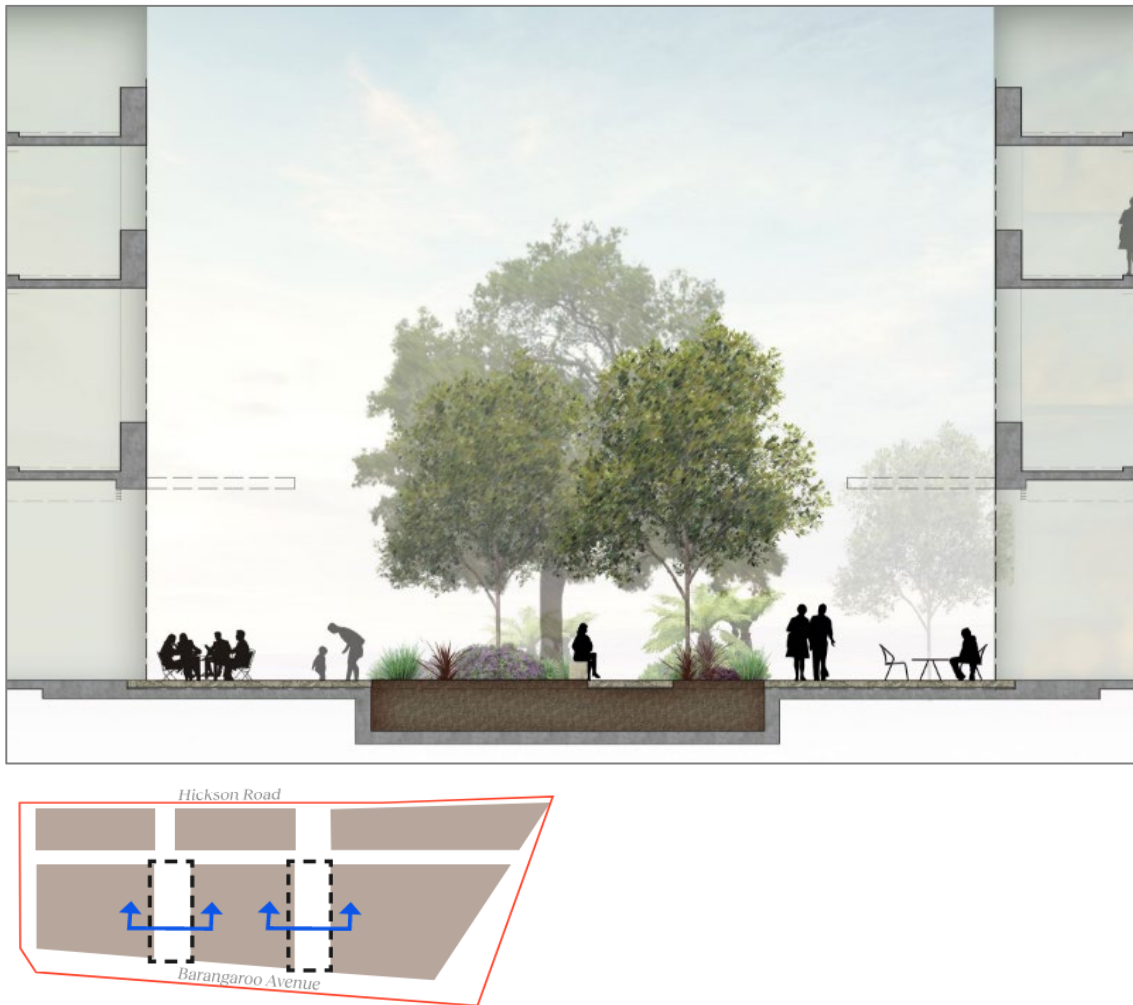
PLAZA NORTH AND PLAZA SOUTH SECTION (SJB)
